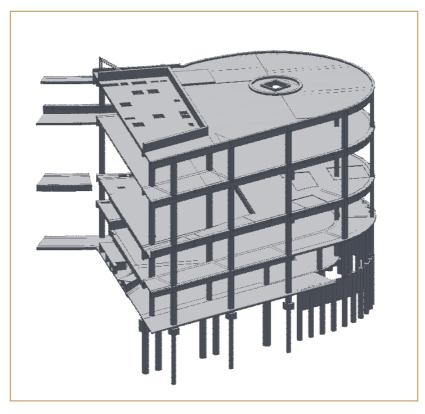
INDICATIVE SECTION OF PART-PODIUM BUILDING STRUCTURE TO BE DEMOLISHED - PROPOSED MODIFICATION 13 WORKS
